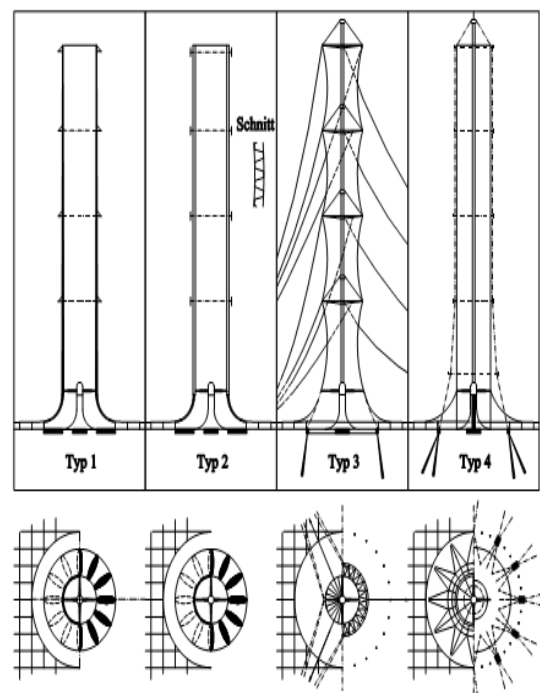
Chimney construction shapes (Bernardes, 2004)
